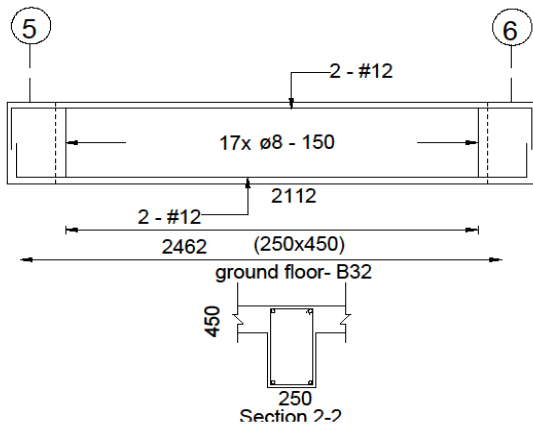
Beam between grid 5 and 6 detailed in AutoCAD
